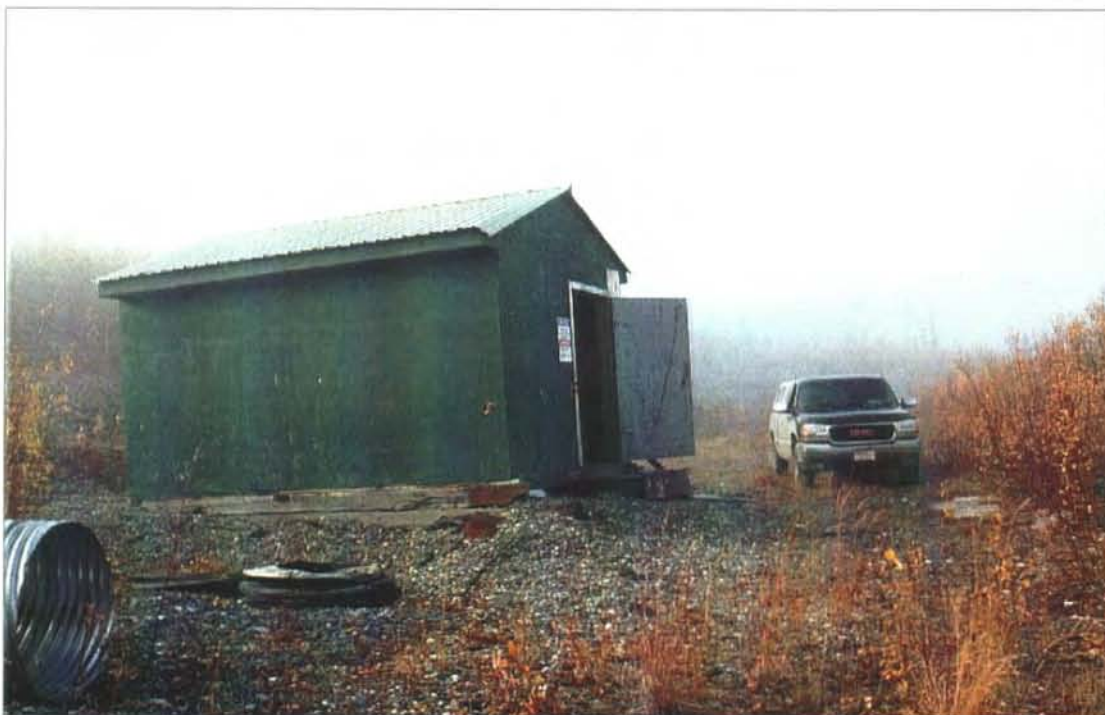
Silver King. Ventilation Raise Building. Looking west, about 100m southeast of the open pit.
